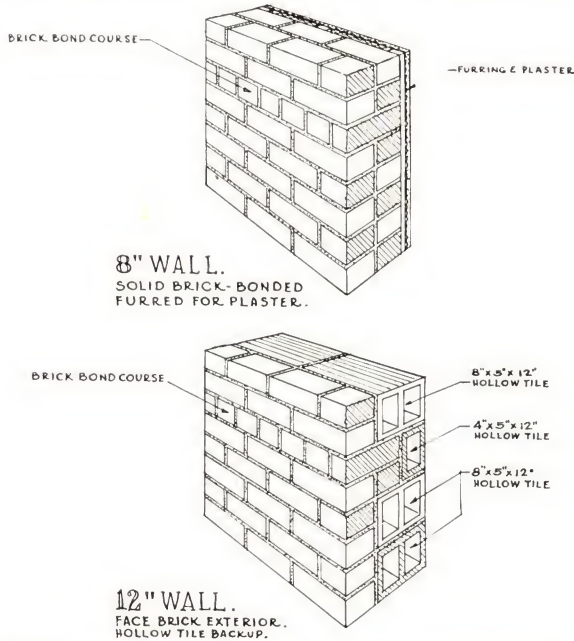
An 8-inch and a 12-inch brick wall backed up with brick and hollow tile.
